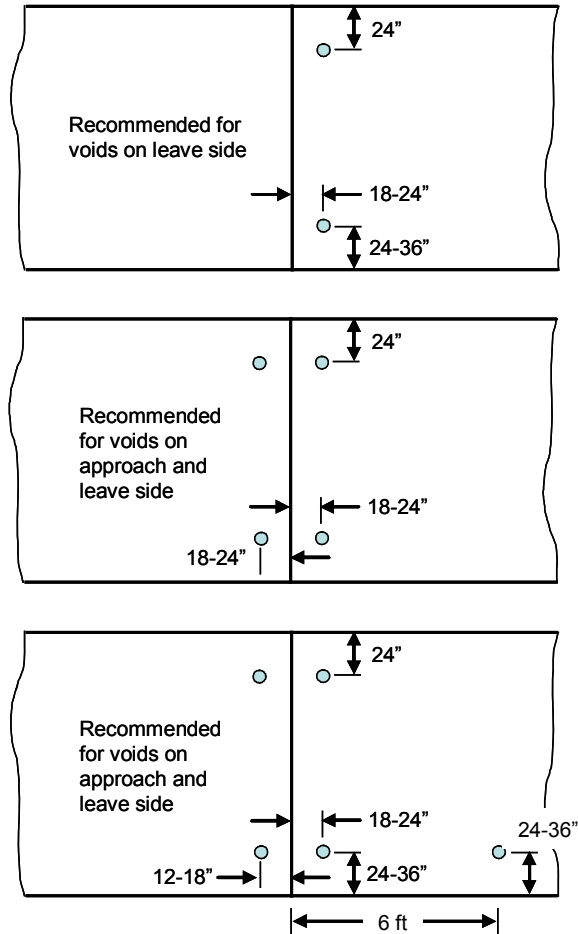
Recommended drill hole locations (redrawn, courtesy John Roberts).
